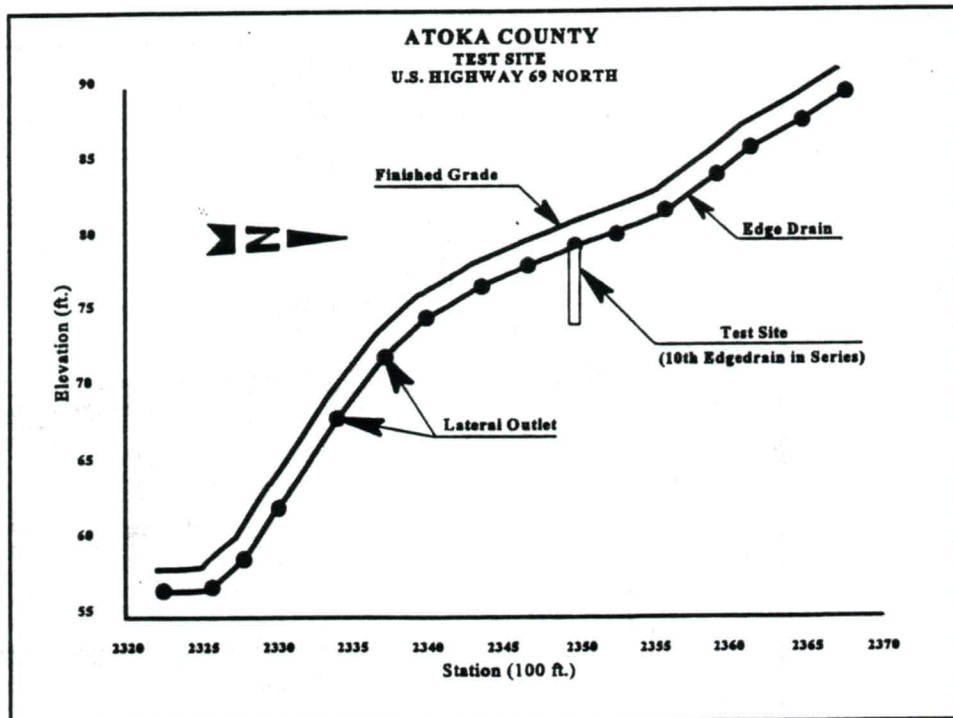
Longitudinal slope of the roadway at the Atoka county site
